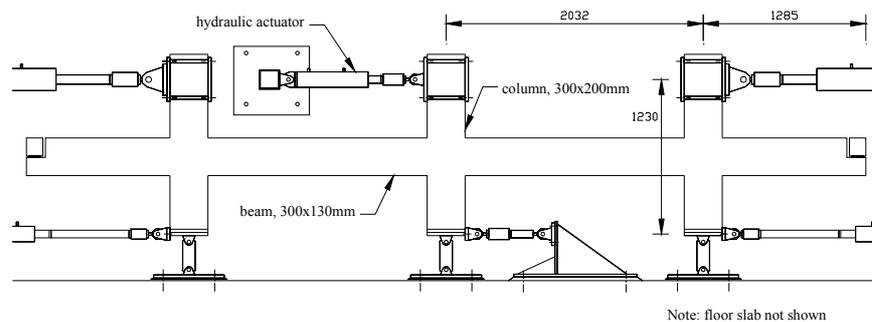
Test arrangement of 3-bay frame with composite slab (Fenwick *et. al.* 1995).
